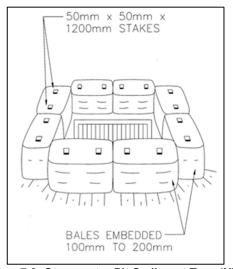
Stormwater Pit Sediment Trap (NTS)
